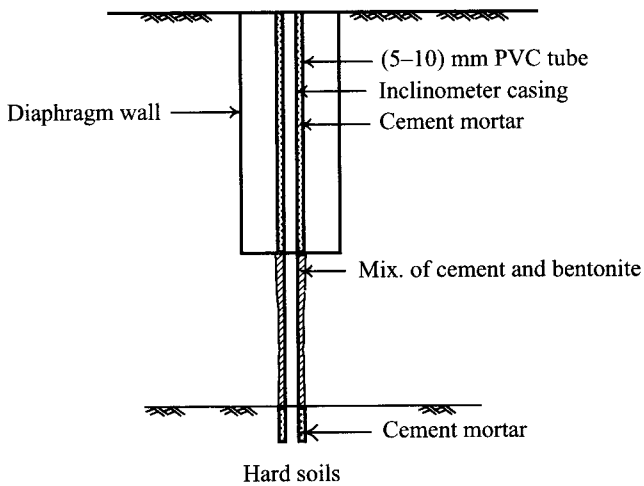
Schematic diagram of the installation of the inclinometer casing in a diaphragm wall.
